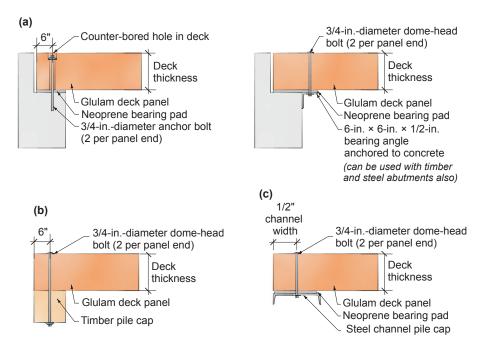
Longitudinal glulam deck bearing details: (a) deck to concrete abutment details; (b) deck to wood abutment details; and (c) deck to steel abutment details.
